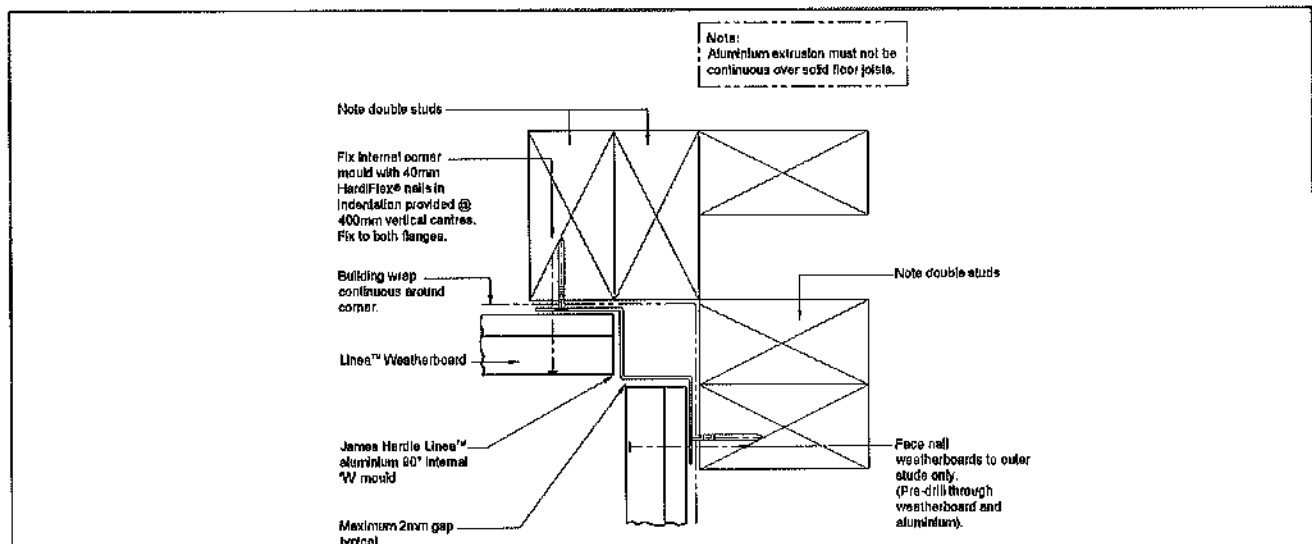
DIRECT FIX INTERNAL 90° ALUMINIUM 'W' MOULD CORNER
